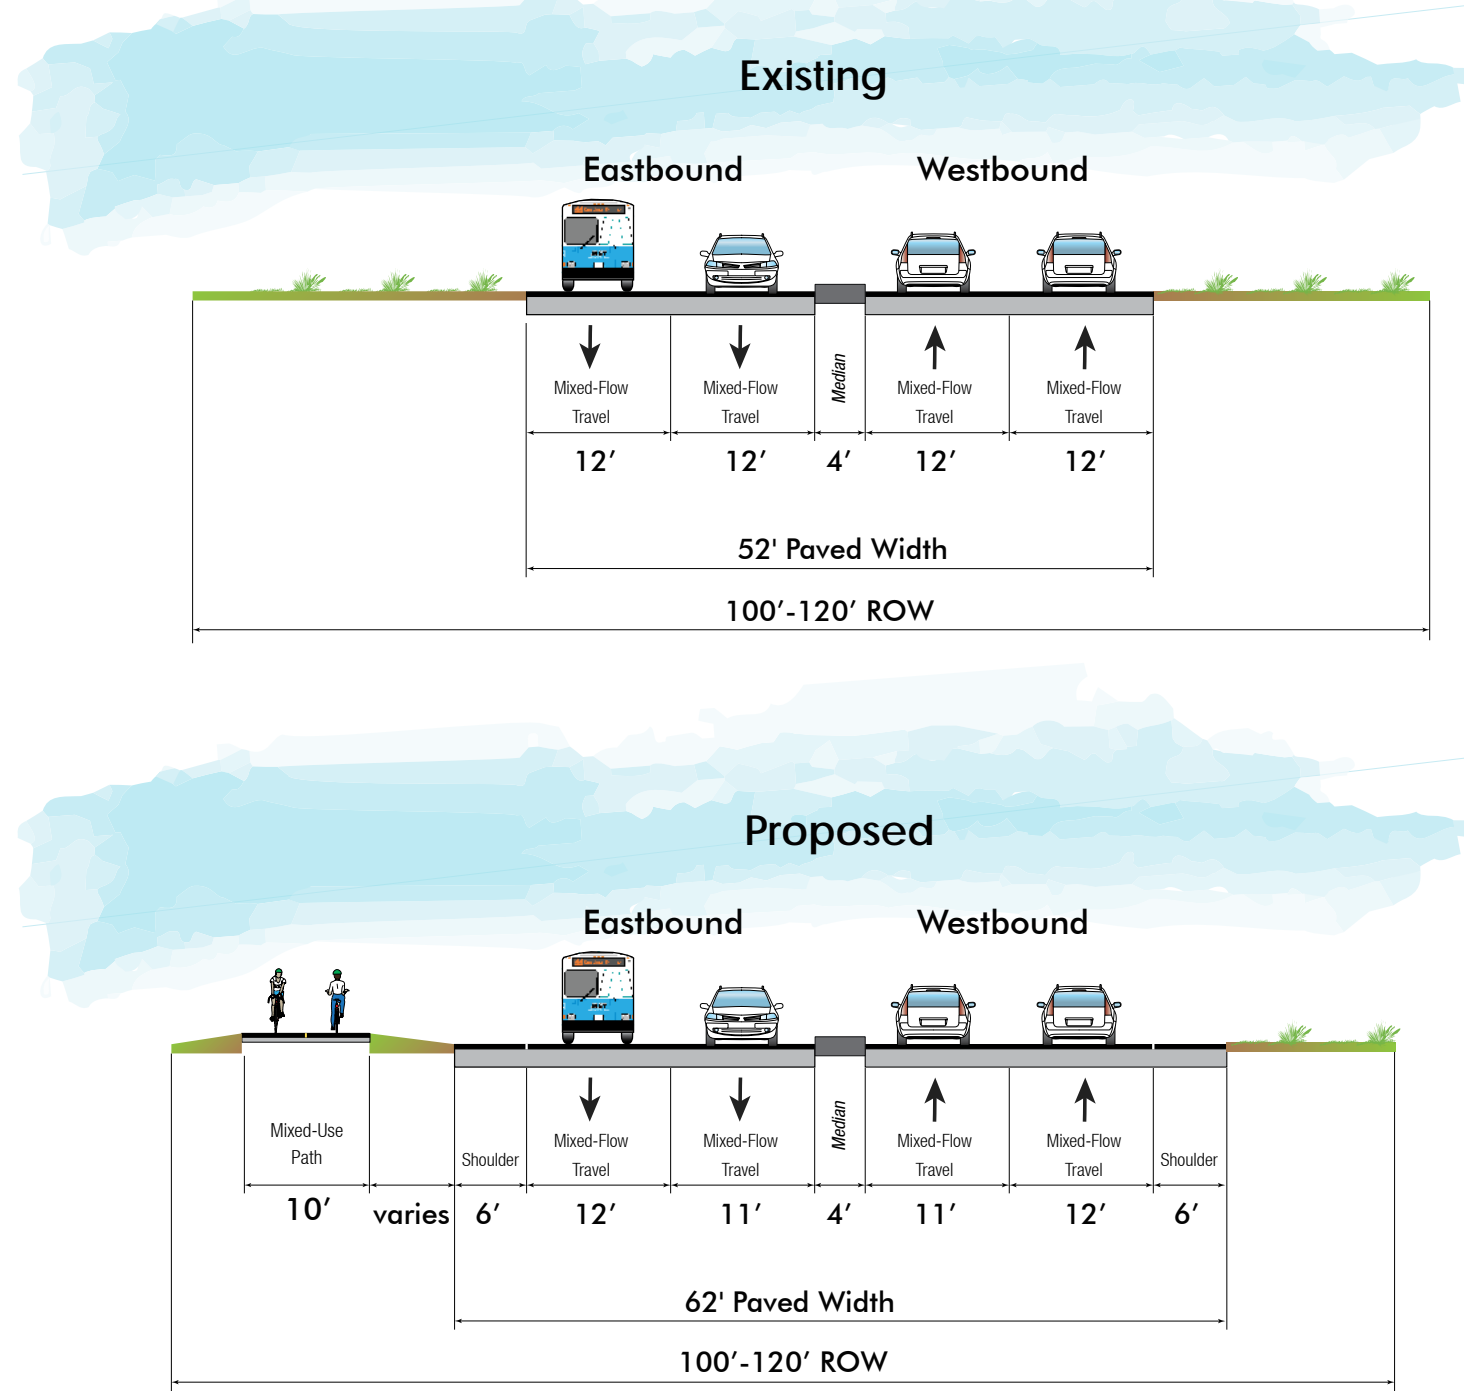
Typical Cross Section: Reservation Road (East Garrison Road to Imjin Parkway)
